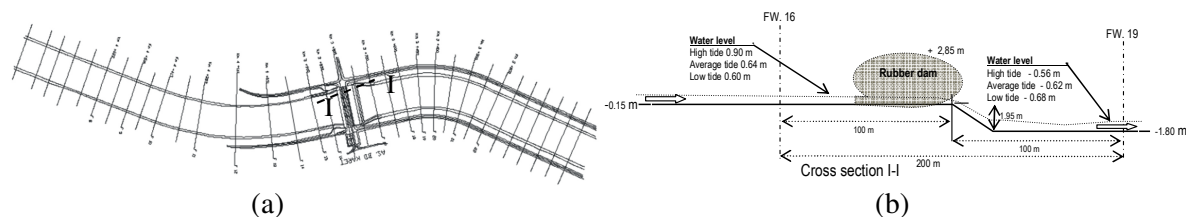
The rubber dam of floodway: (a) top view, and (b) cross section I-I view
